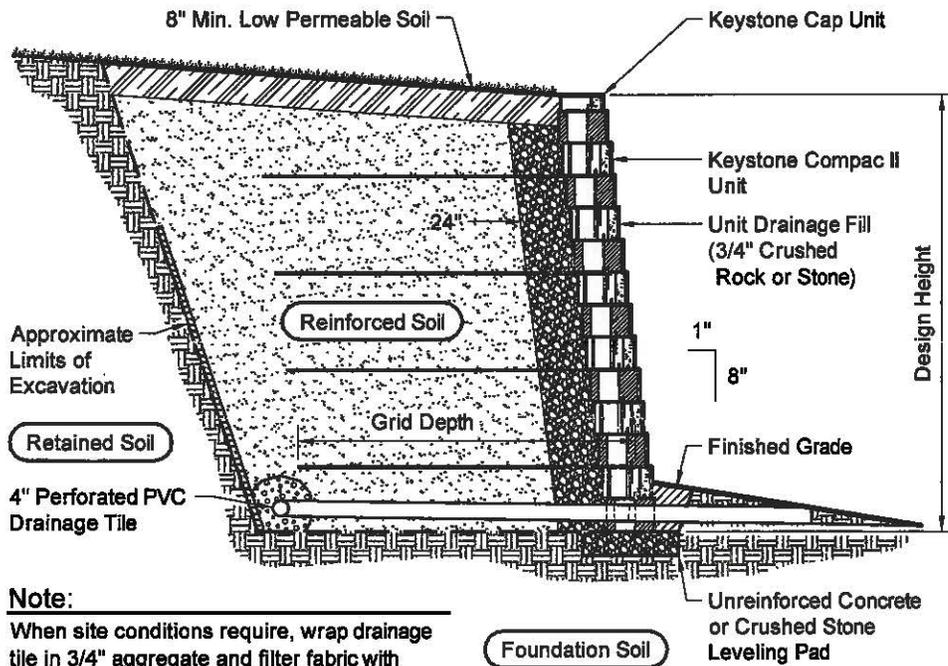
(REINFORCED WALL) NEAR VERTICAL SETBACK
